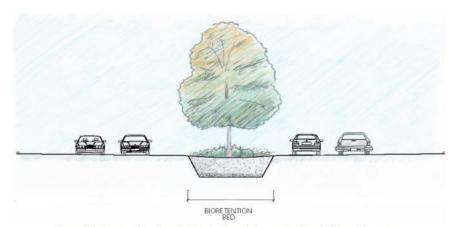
Cross-section view of a bioretention cul-de-sac. The island of the cul-de-sacs accepts stormwater from surrounding pavement
